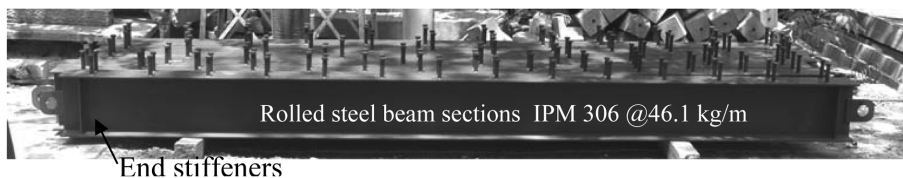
Rolled steel beams with welded stud connectors and stiffeners
